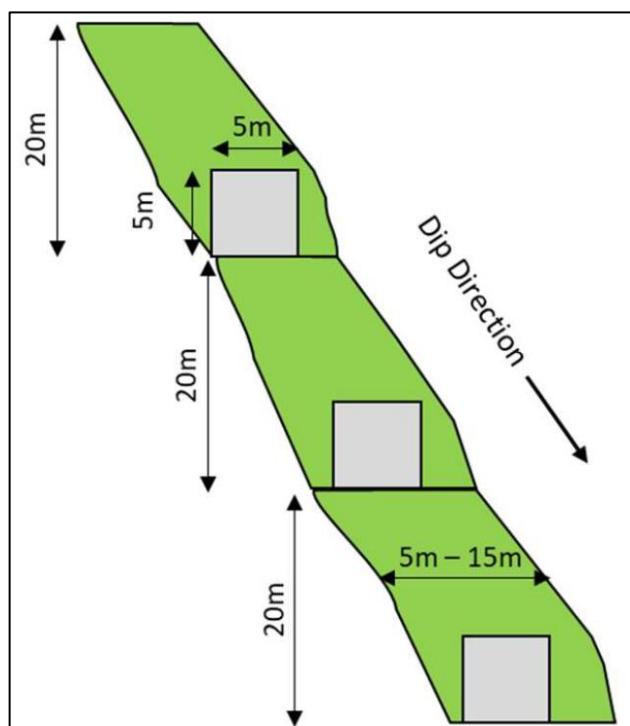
Rupice Longitudinal Long Hole Open Stopping Layout (Source: Ausenco)
